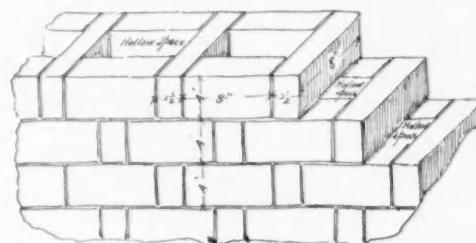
DETAIL OF THE HAMILTON BUILDING, PORTLAND, OREGON.
